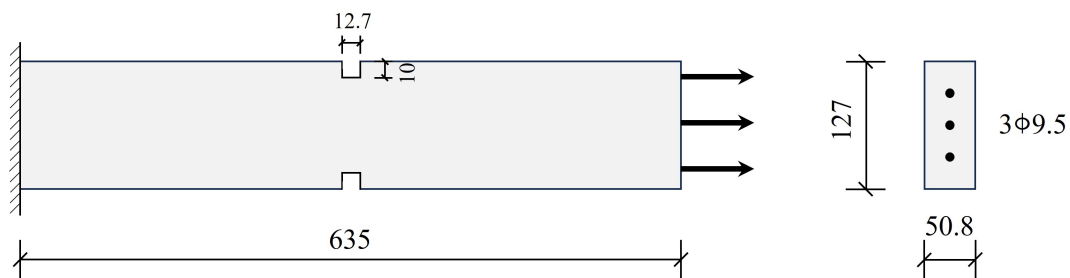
Load layout and geometry of notched RC beams under direct tension (Unit: mm)
